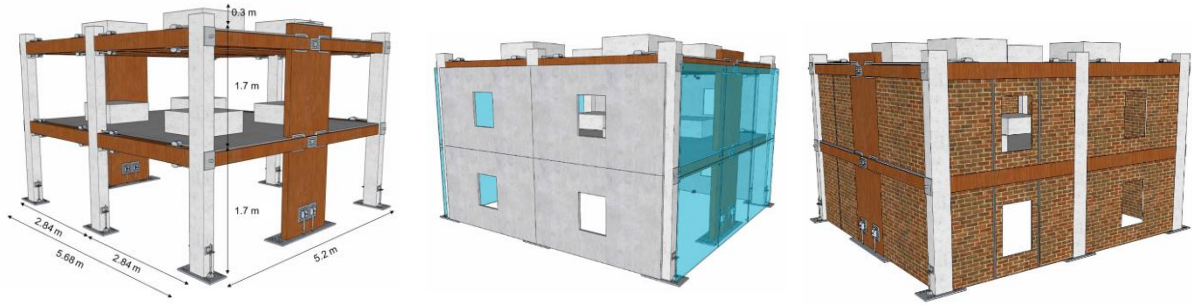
Low-Damage Concrete-Timber Test Building, 1/2 scale two storey two-bays, under shake-table tests at LNEC, Lisbon (SERA Project, Pampanin et al., 2017)
